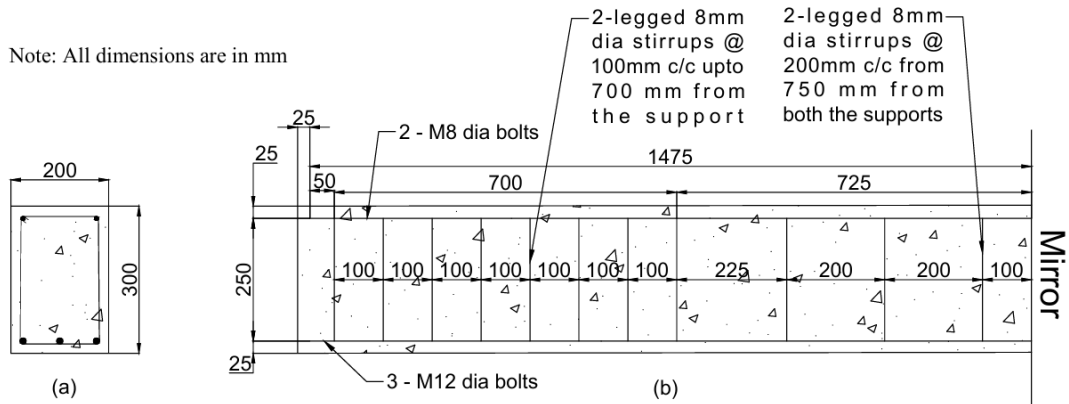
(a) Cross-Section and (b) Longitudinal Section of RC beam girder
